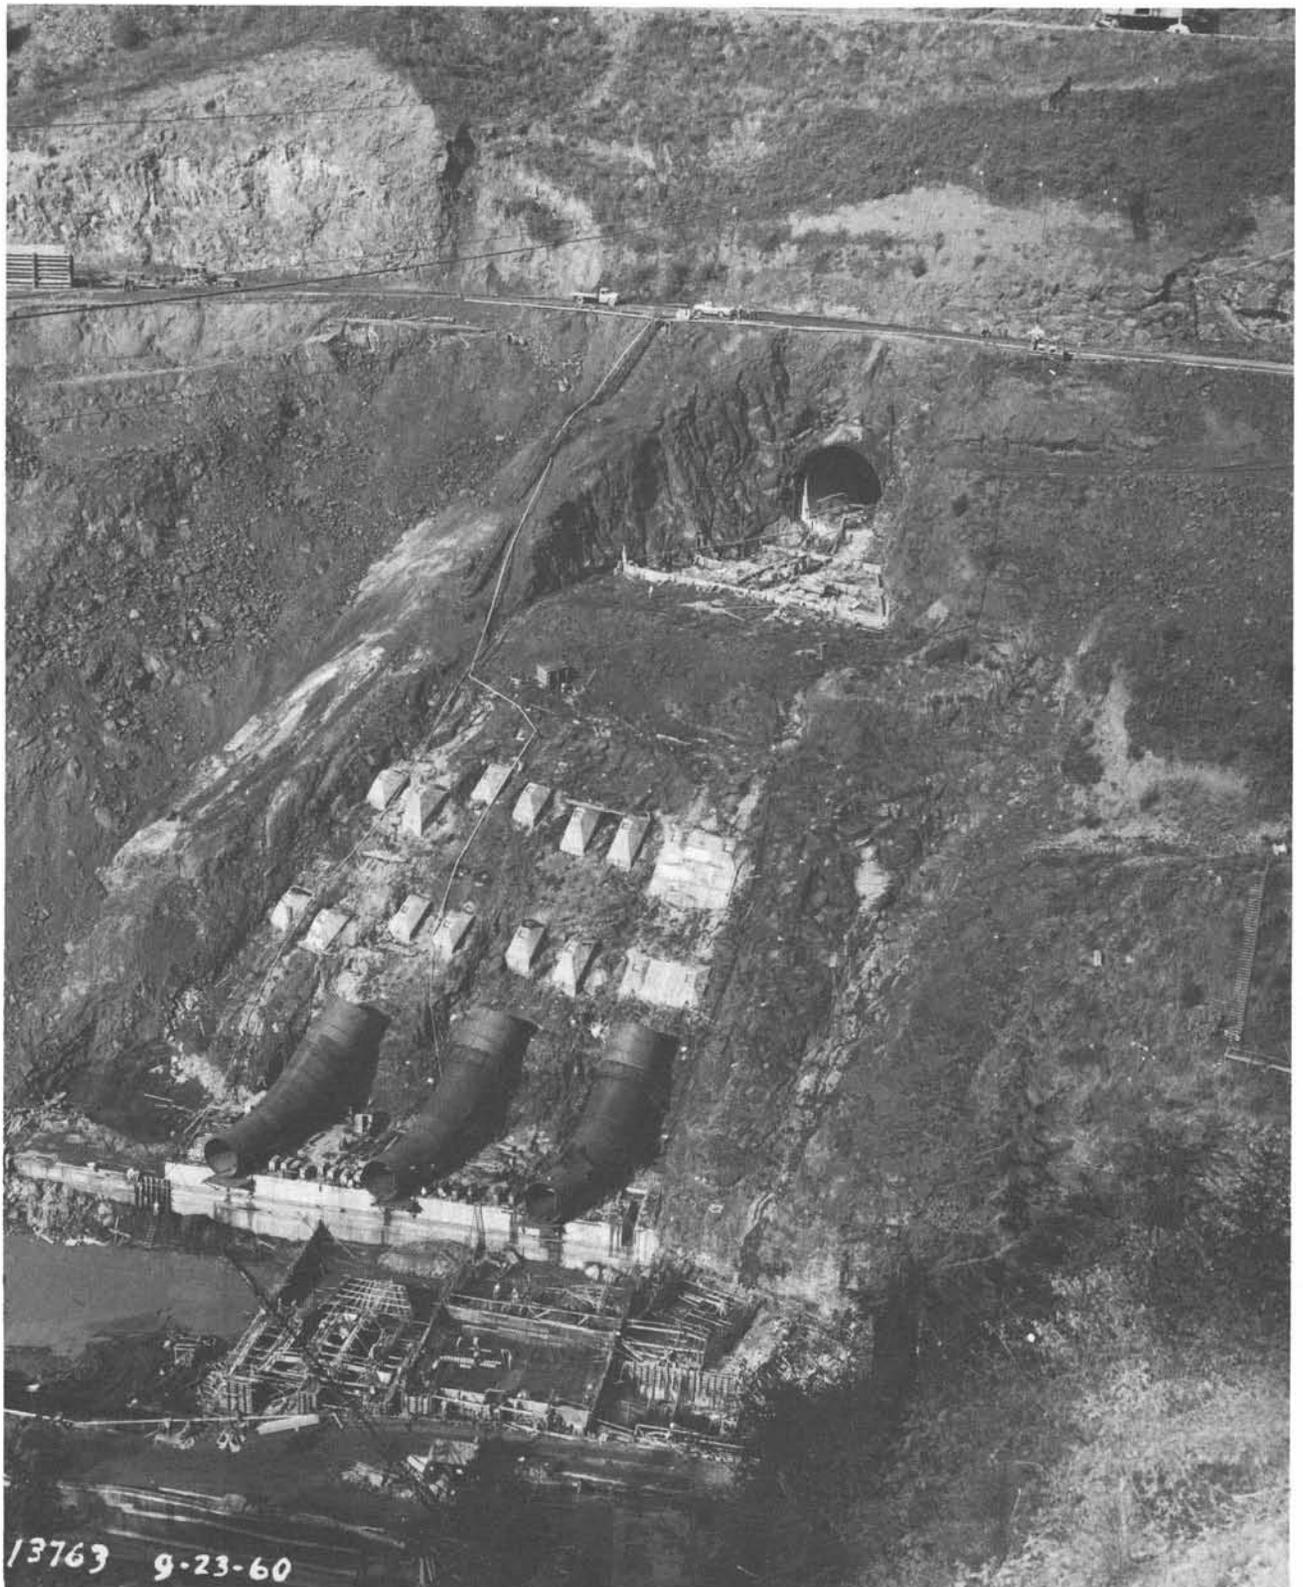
General view of the landslide in the area of the Mayfield Dam, powerhouse, and penstock. The actual slide surface can be seen just to the left of the penstock excavation. The power tunnel portal emerges into the forebay area. Photo by Tacoma City Light.
